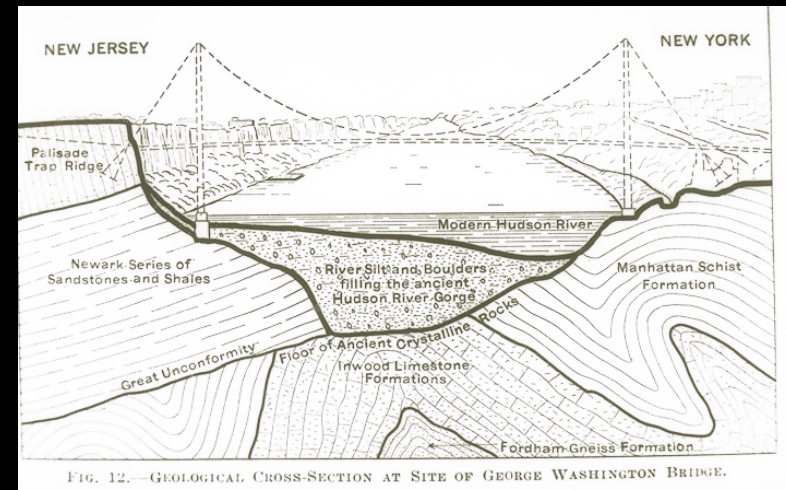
GEOLOGICAL CROSS-SECTION AT SITE OF GEORGE WASHINGTON BRIDGE.
